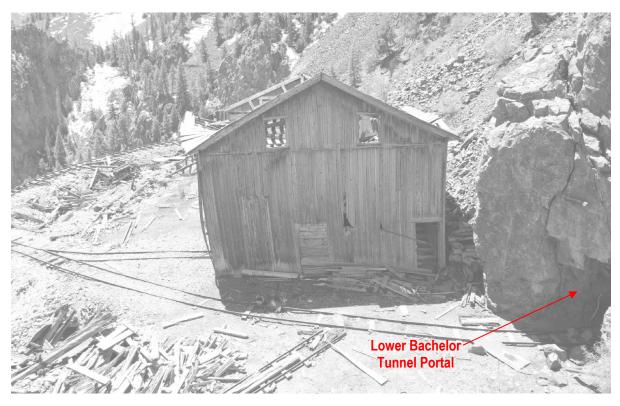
Aerial view of Blacksmith Shop building, view south.
